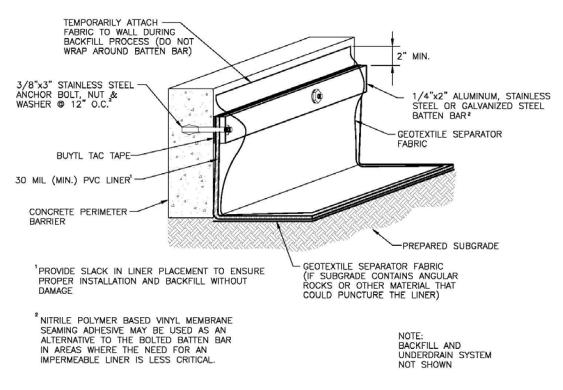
Geomembrane Liner/Concrete Connection Detail
